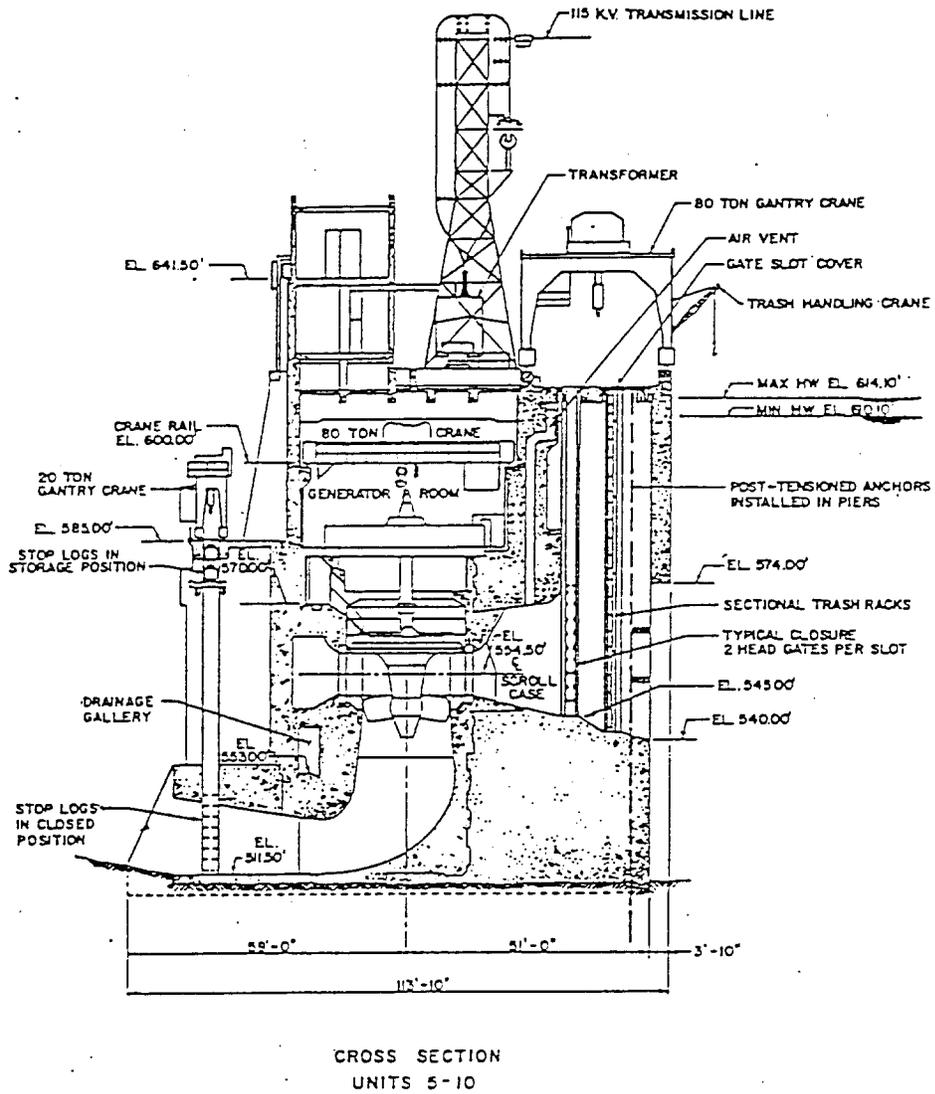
Rock Island dam Powerhouse 1 cross-section at Kaplan unit
